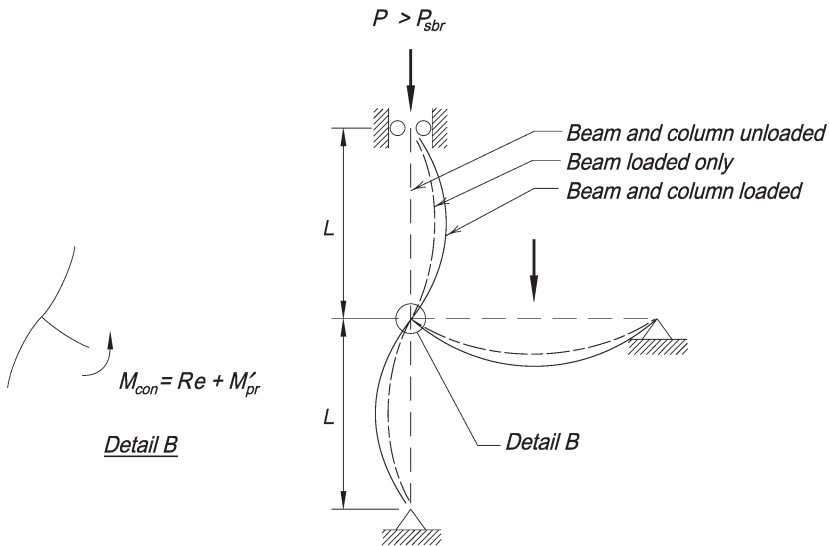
Illustration of beam, column and connection behavior under loading of beam and column.
